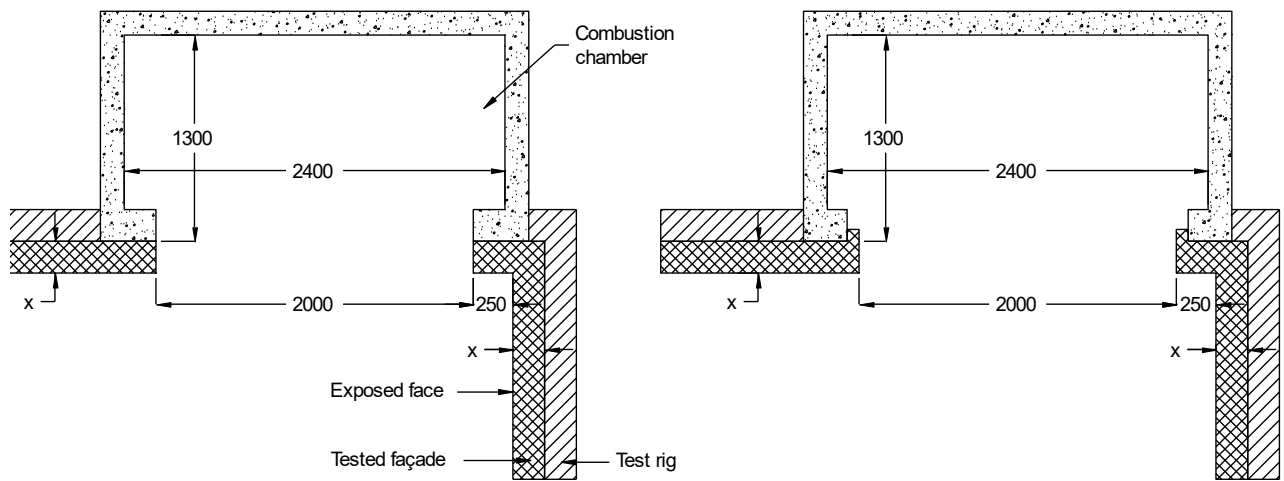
Horizontal section of the detailing at the edges of openings schematically exemplified. The general closing configuration is shown on the left, the detail as in practice is shown on the right, x refers to the actual thickness of the tested façade.
